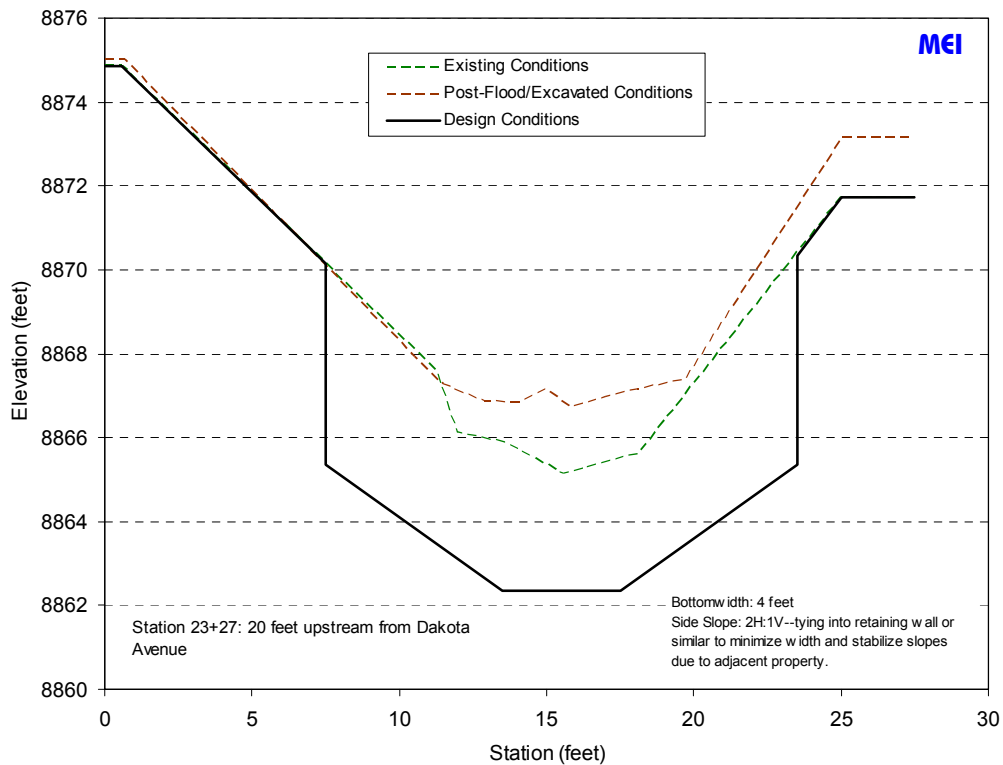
Cross-sectional schematic showing existing and post-flood/excavated conditions channel and channel design template at Sta 23+27.
